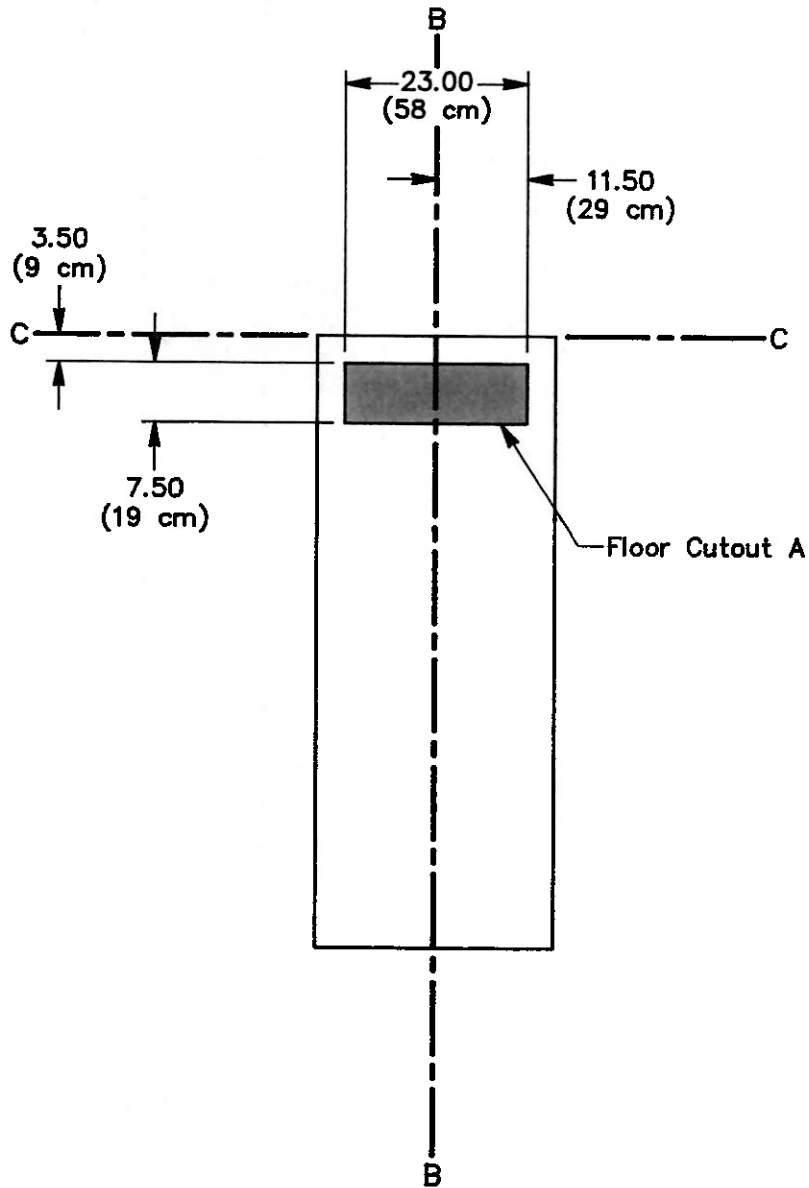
Location and Dimensions of MFC Floor Cutout A
